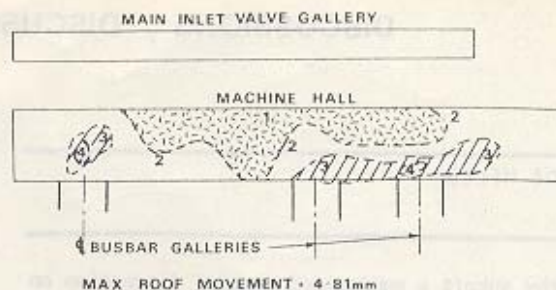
Plan of Machine Hall Roof - Showing Movements (mm)
